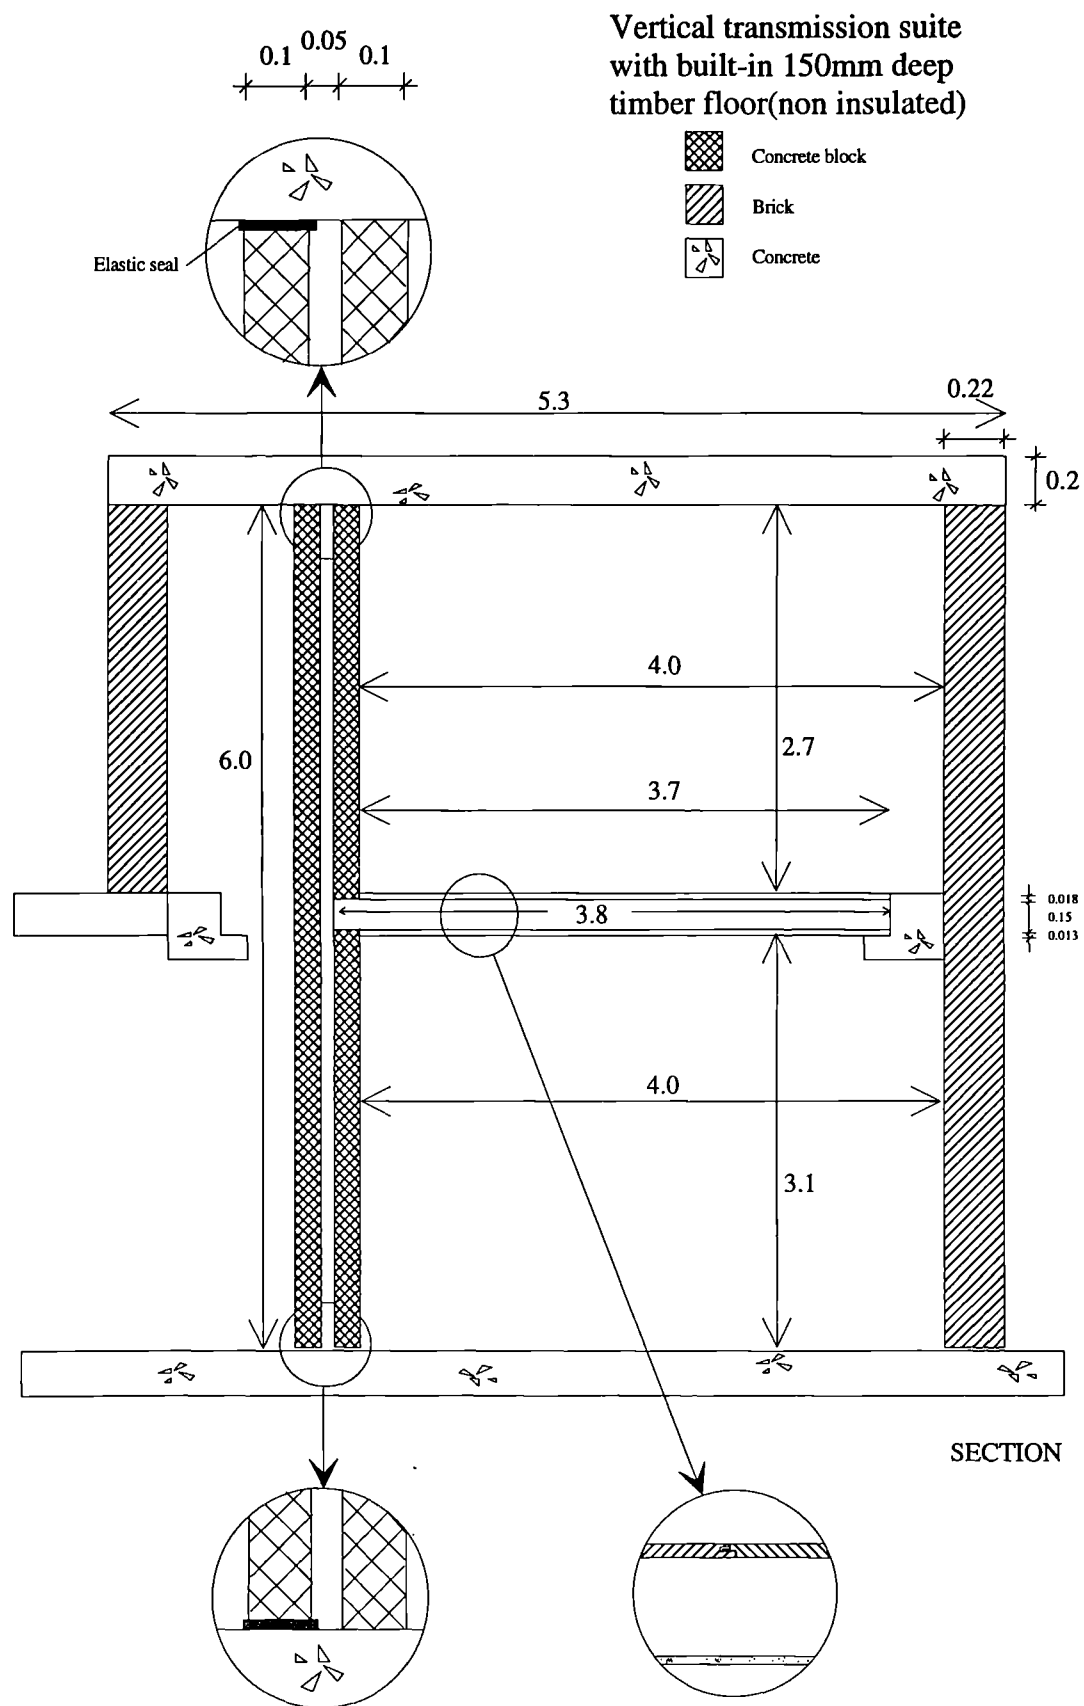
Section through the vertical transmission suite and timber floor built in to the common opening.
